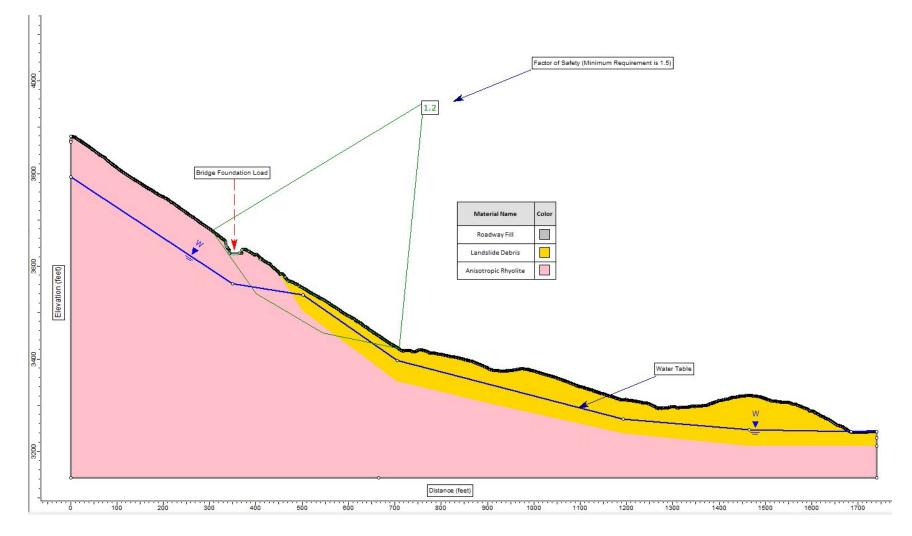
Slope stability analysis of east abutment location with the adverse, steeply dipping rhyolitic rock discontinuity and approximate bridge loads.
